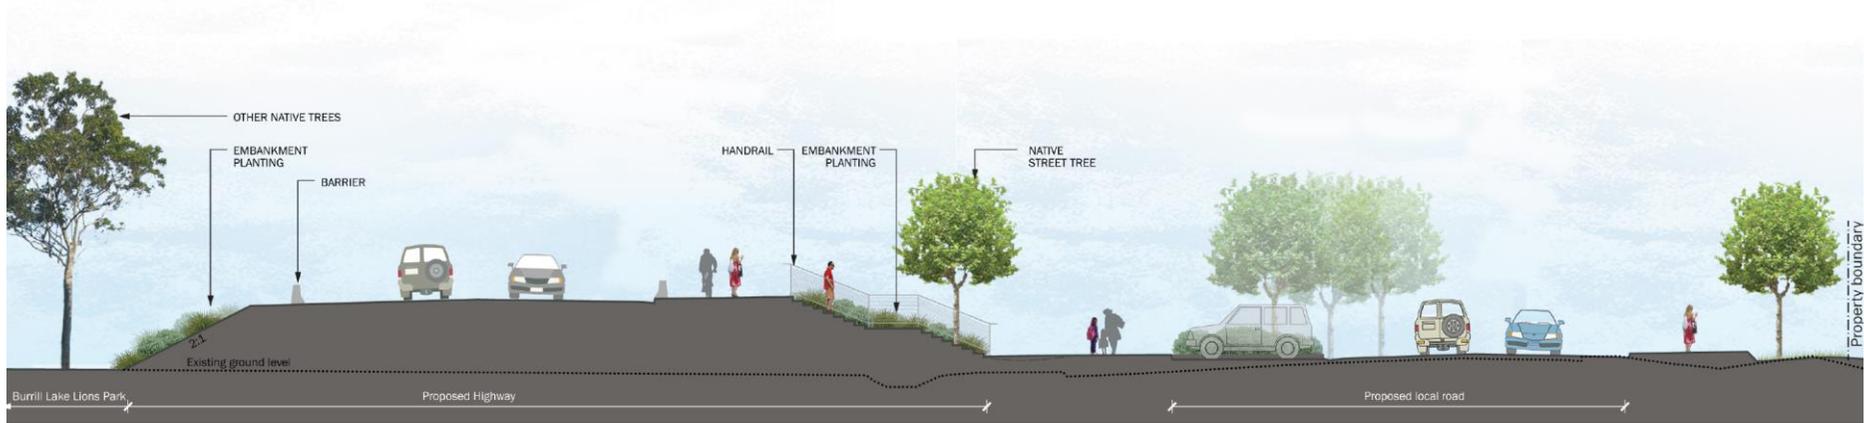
Southern approach cross section (Jackson Teece 2013).
